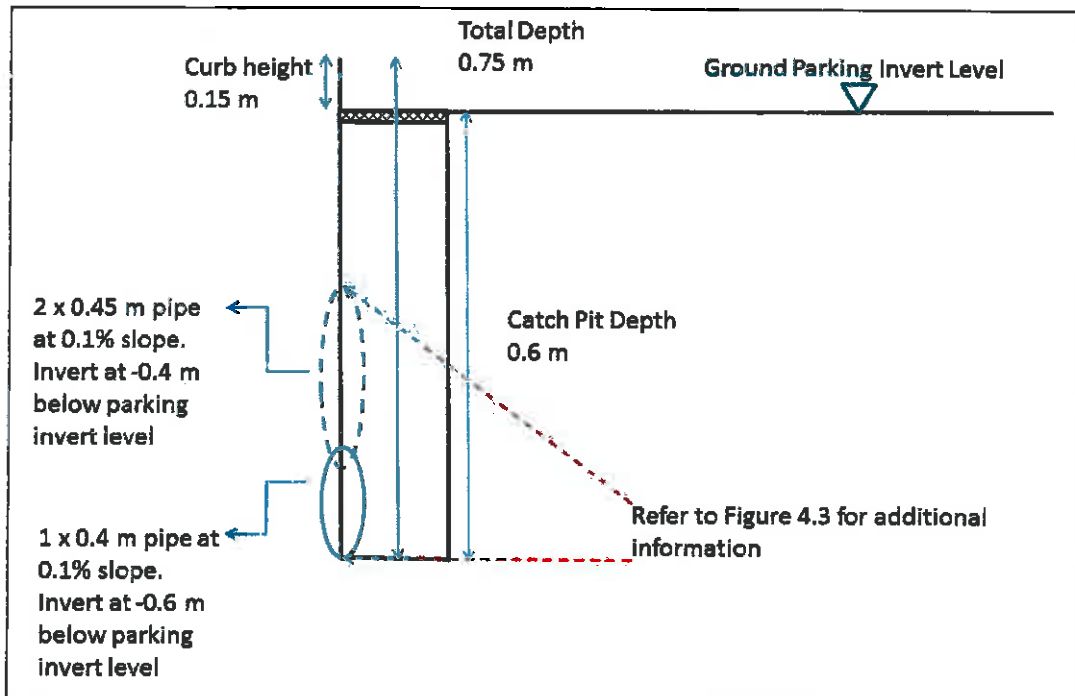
Conceptual Long Section Schematic of the Ground Level Catch Pit and the Stormwater Diversion Pipes.
